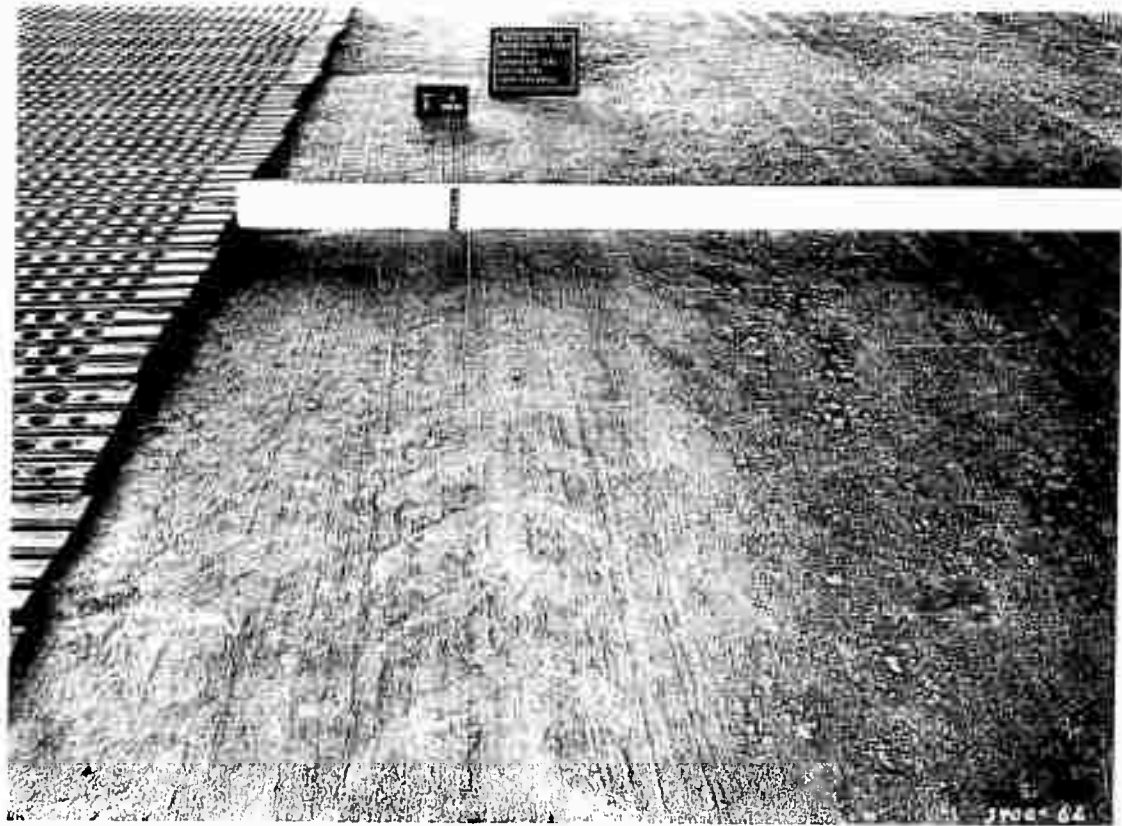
Localized failure at sta 0+77, lanes B and C, section II, after 2 applications of traffic
